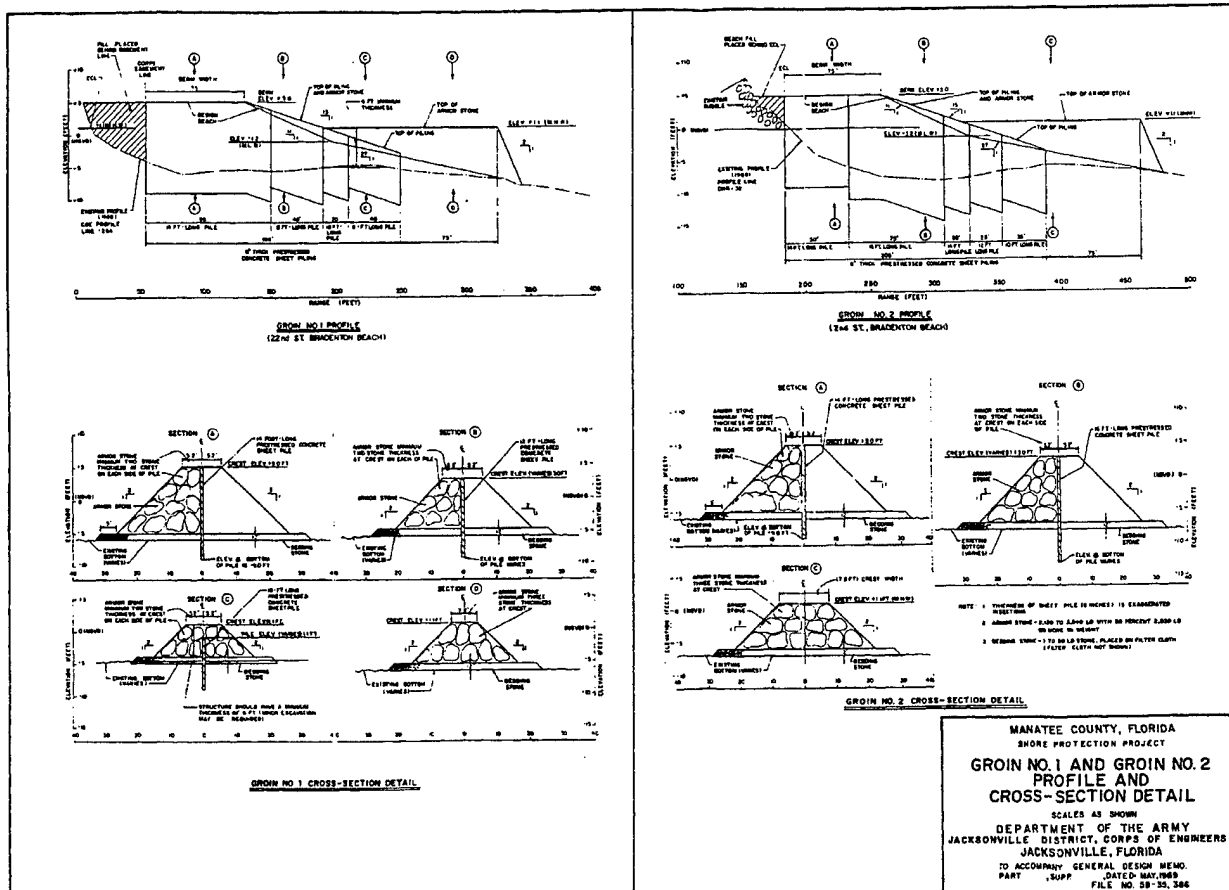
Groin No. 1 and Groin No. 2 profile and cross-section detail, Manatee County, FL (USAED, Jacksonville 1990) PLATE 12
